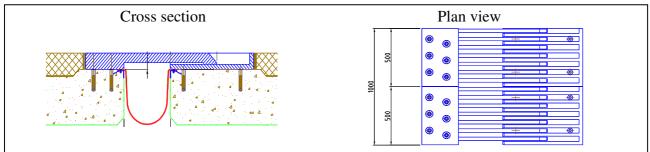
Cross Section and Plan View of Tensa[®]*Flex Sliding Finger Joint
